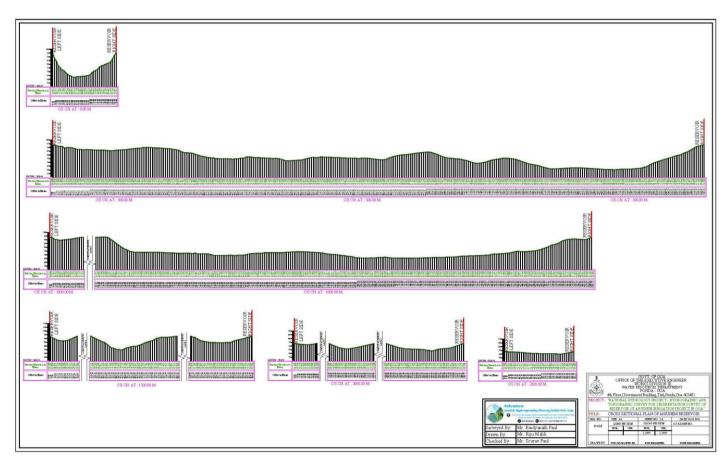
Cross Sectional Plan of Anjunem Dam near Chainage 0.00 m to Chainage 2300m
